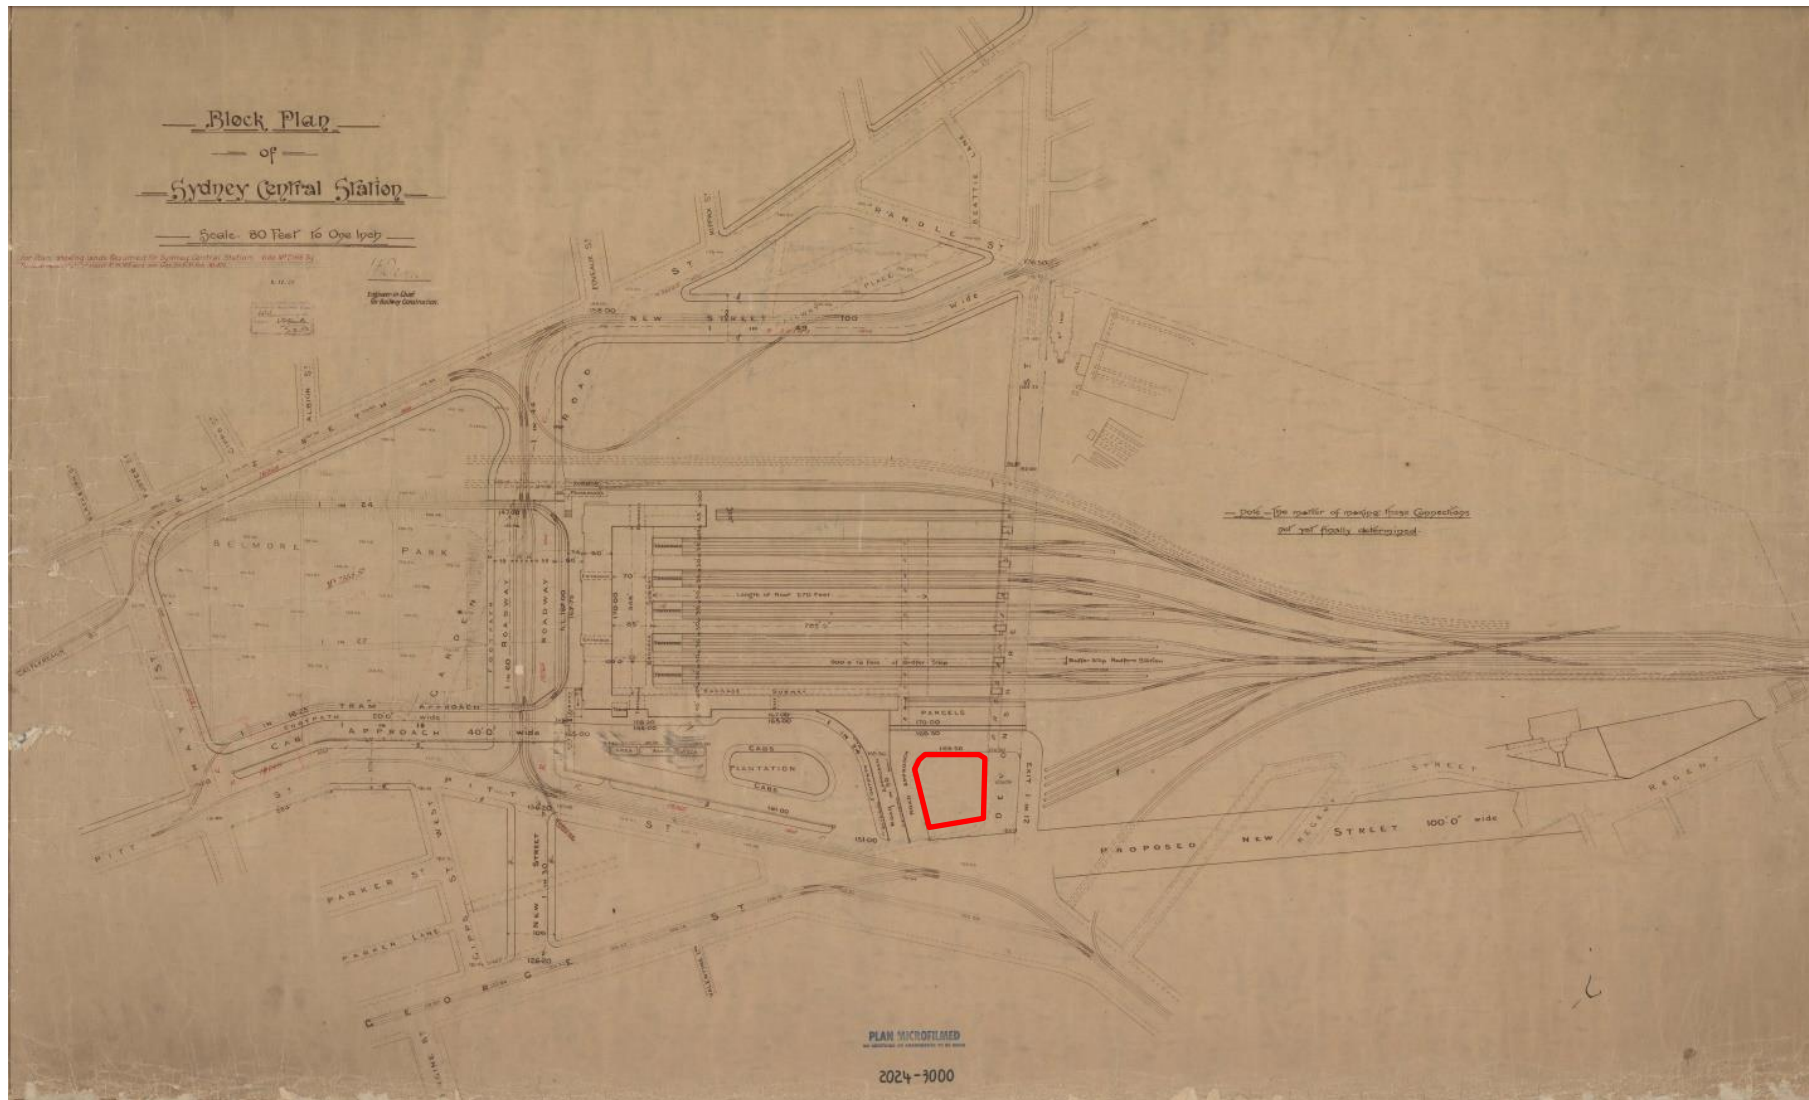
Block plan of Sydney Central Station, 1903. Subject site shown thereon as vacant land.
